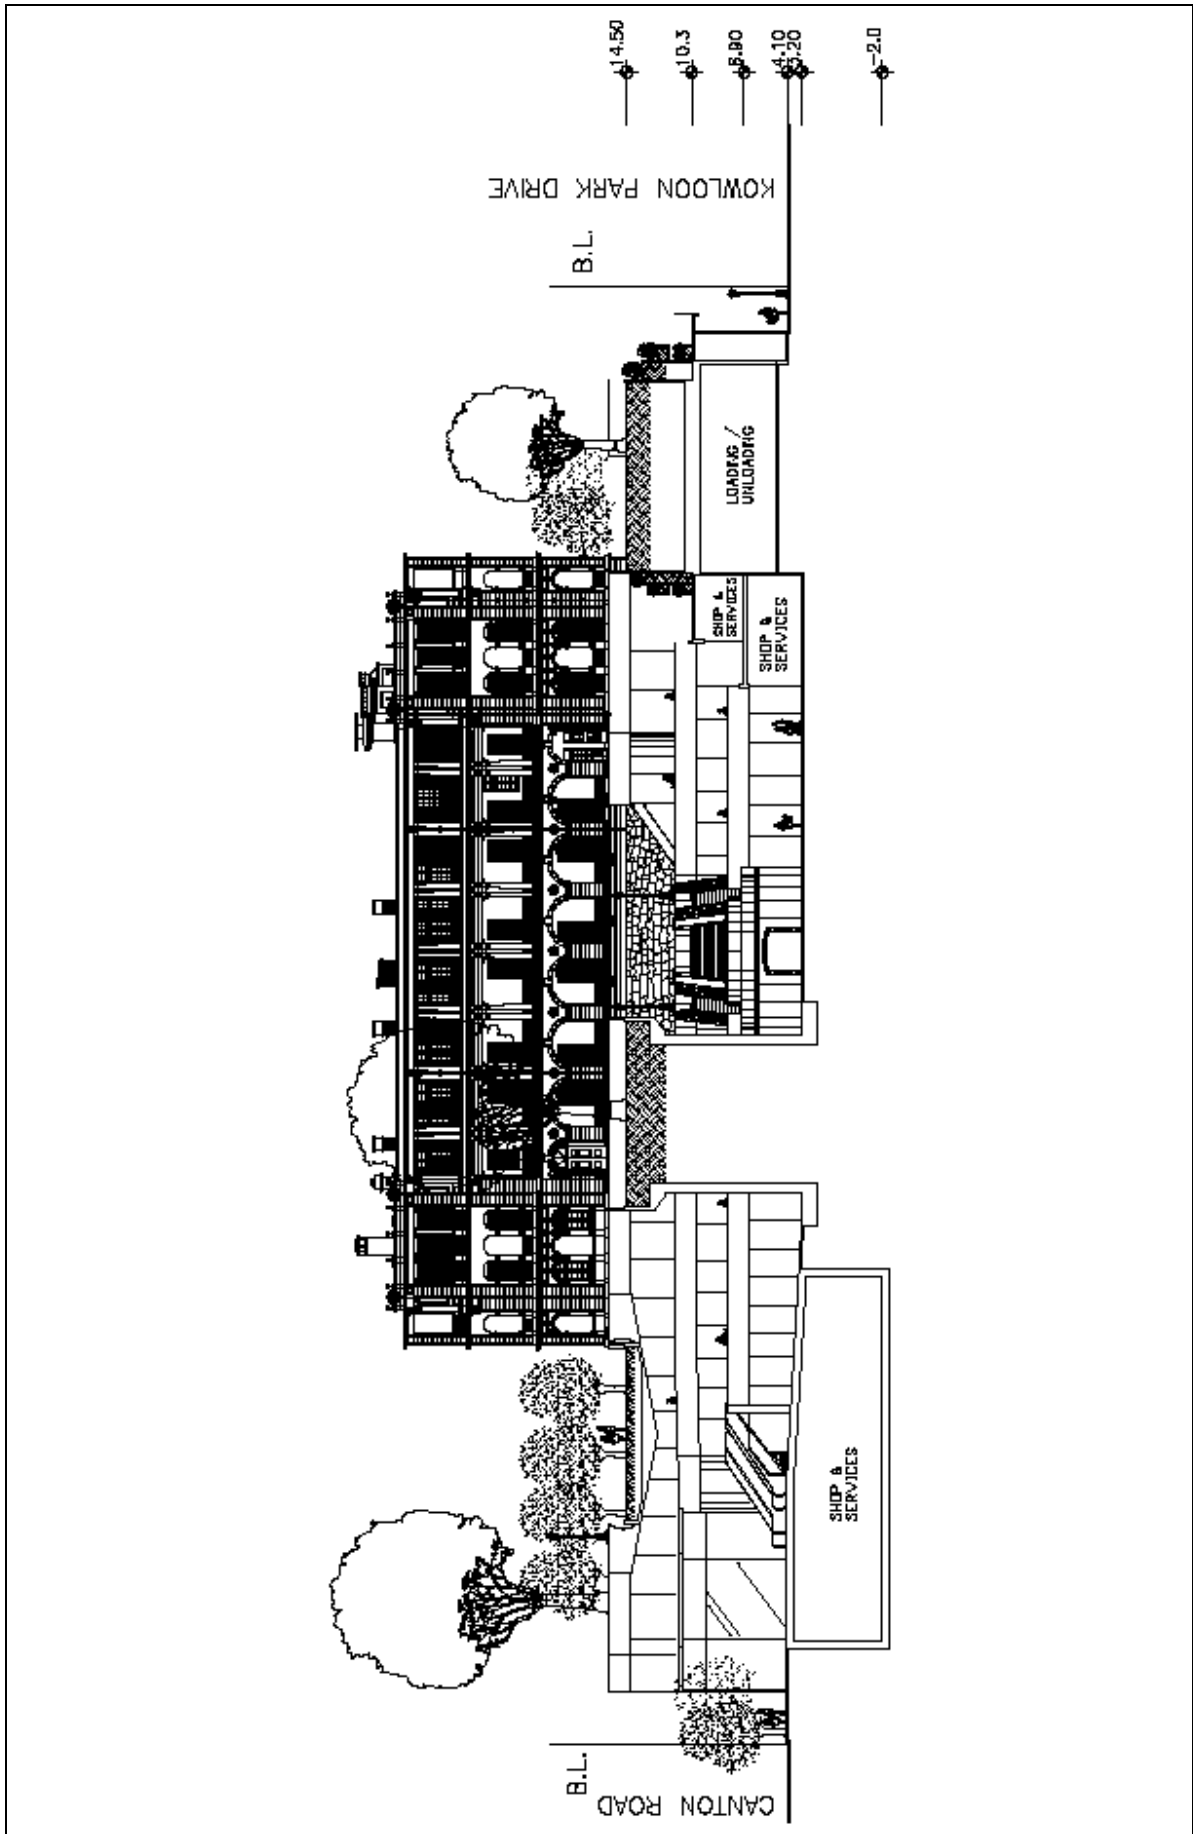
Section Layout of the Newly Proposed Basement Areas
